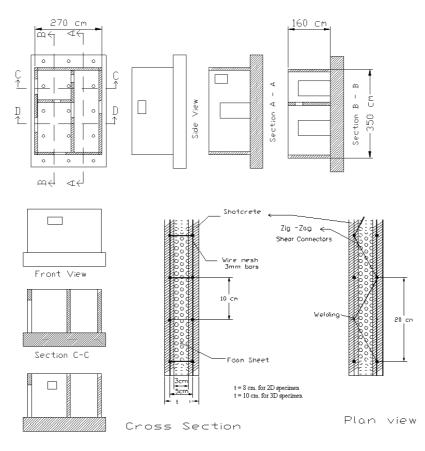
Plan, Cross Sections, and Details of Special Shotcreted Panels
